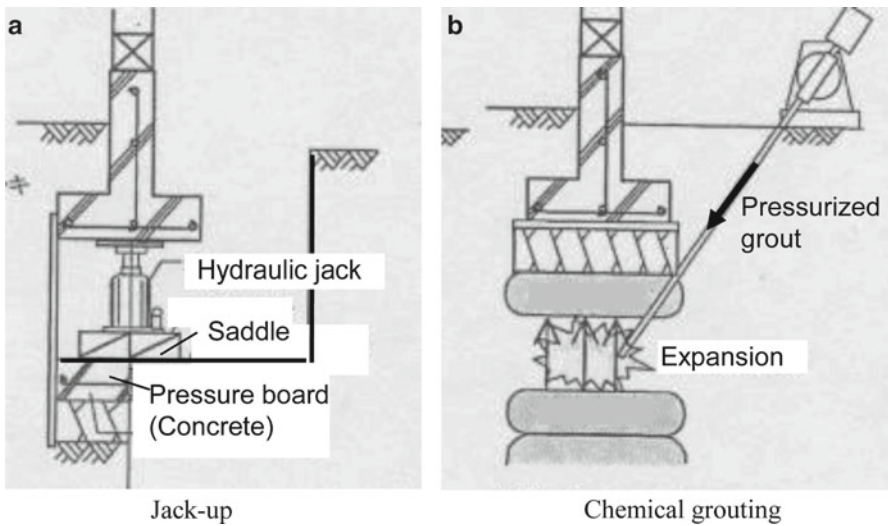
Reconstruction methods for tilting detached houses. (a) Jack-up; (b) chemical grouting (Architectural Institute of Japan 2008)
